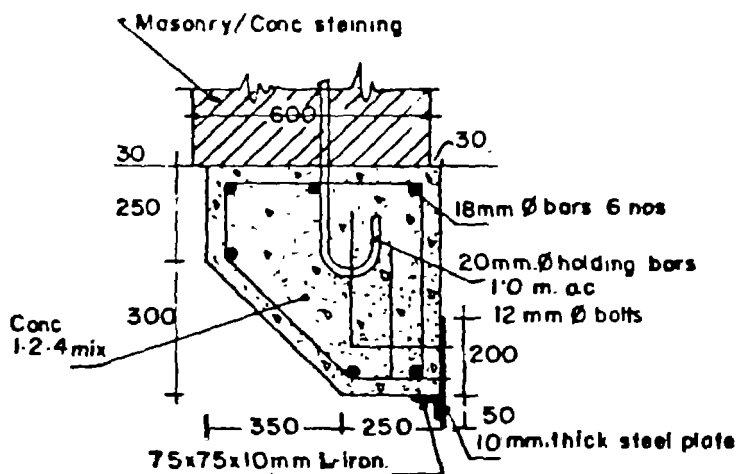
R.C. cutting edge for well diameter > 3 m.
